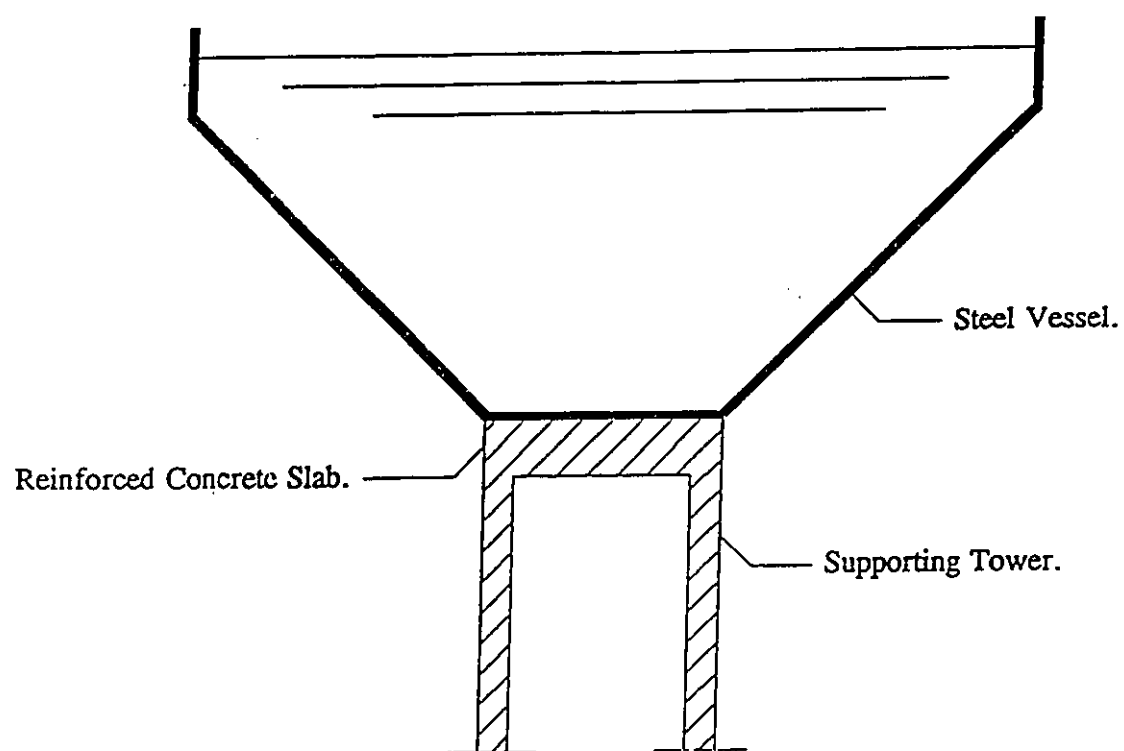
Cross Sectional Elevation of Elevated Conical Tanks.
